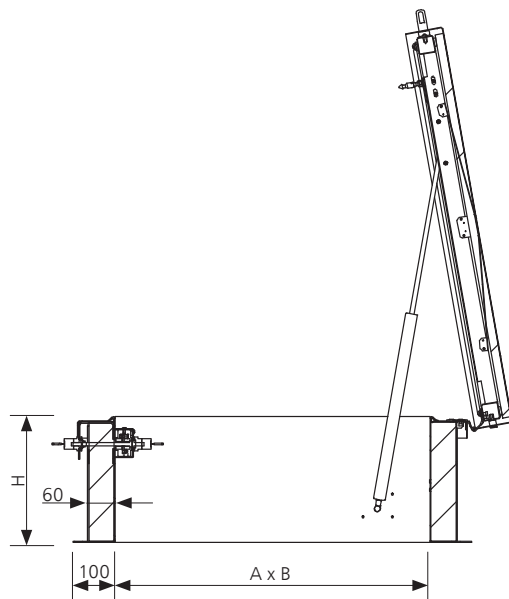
Section B-B of mcr PROROOF ST roof hatch in open position (over stairs), dimensions in [mm]
